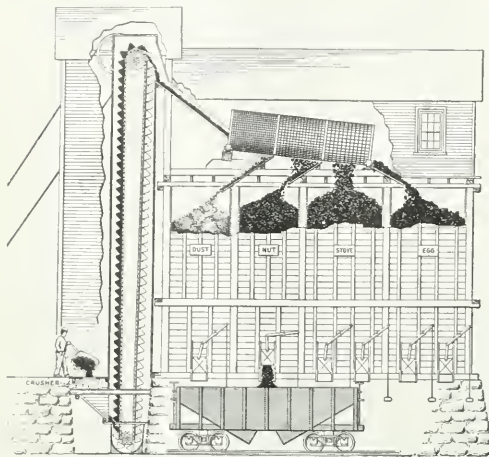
SIDE ELEVATION, SHOWING METHOD OF SIZING AND LOADING
